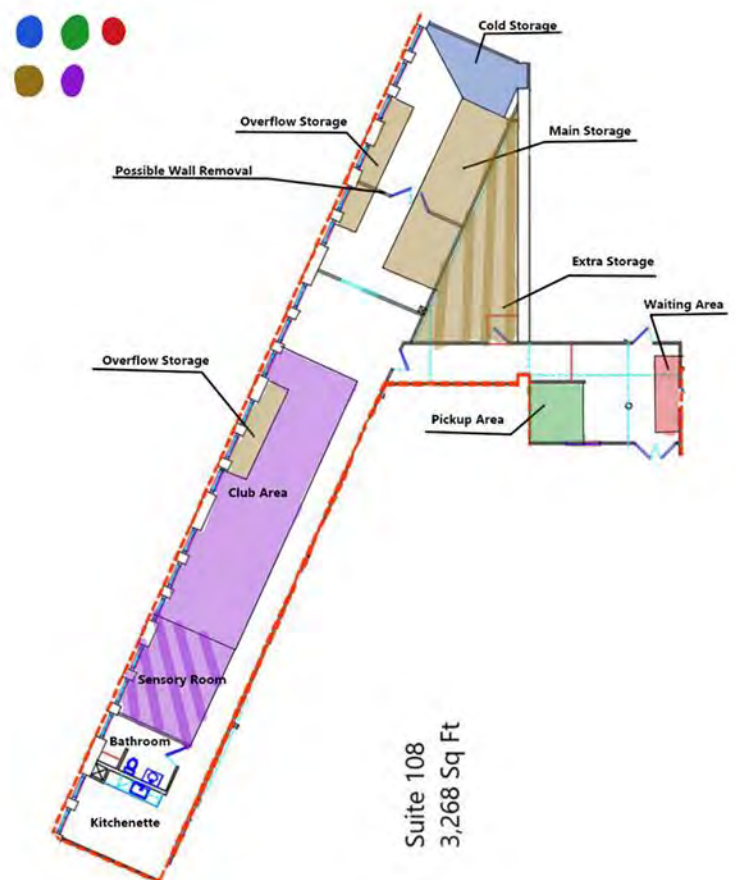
Site Layout for the Food Pantry, Club Area, and Sensory Room
